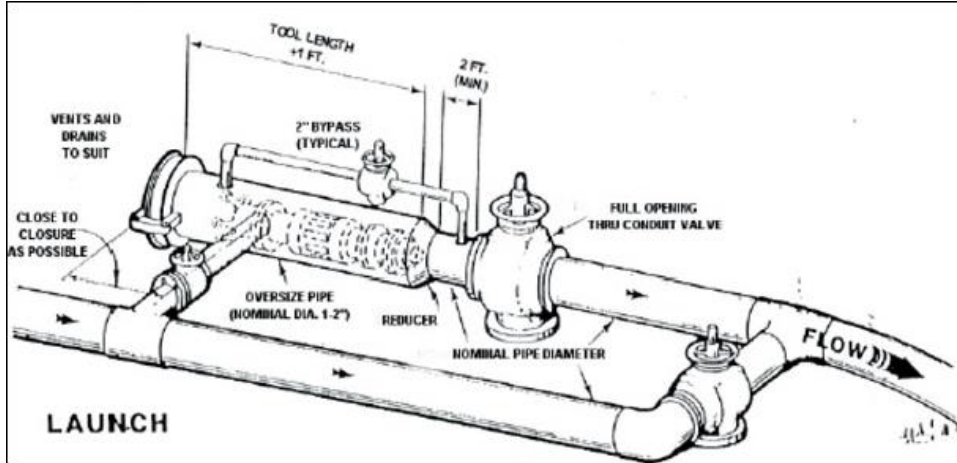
Sketch of a pig launcher (Source: Sweco Fab. Inc.)
